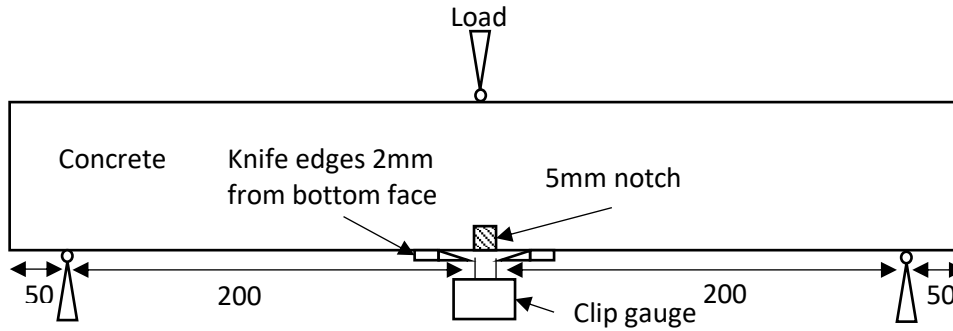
Three-point bend test set-up (dimensions in mm).
